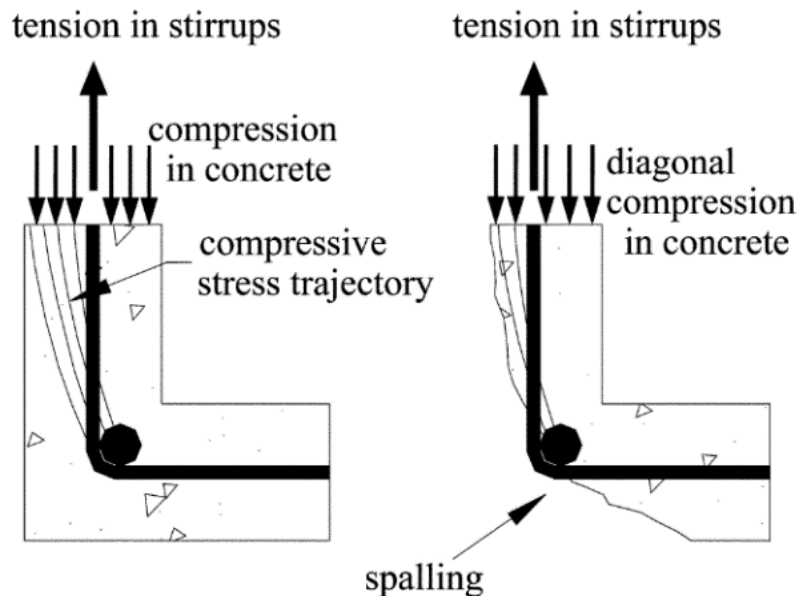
Spalling of concrete cover in beams subjected to shear[25]
